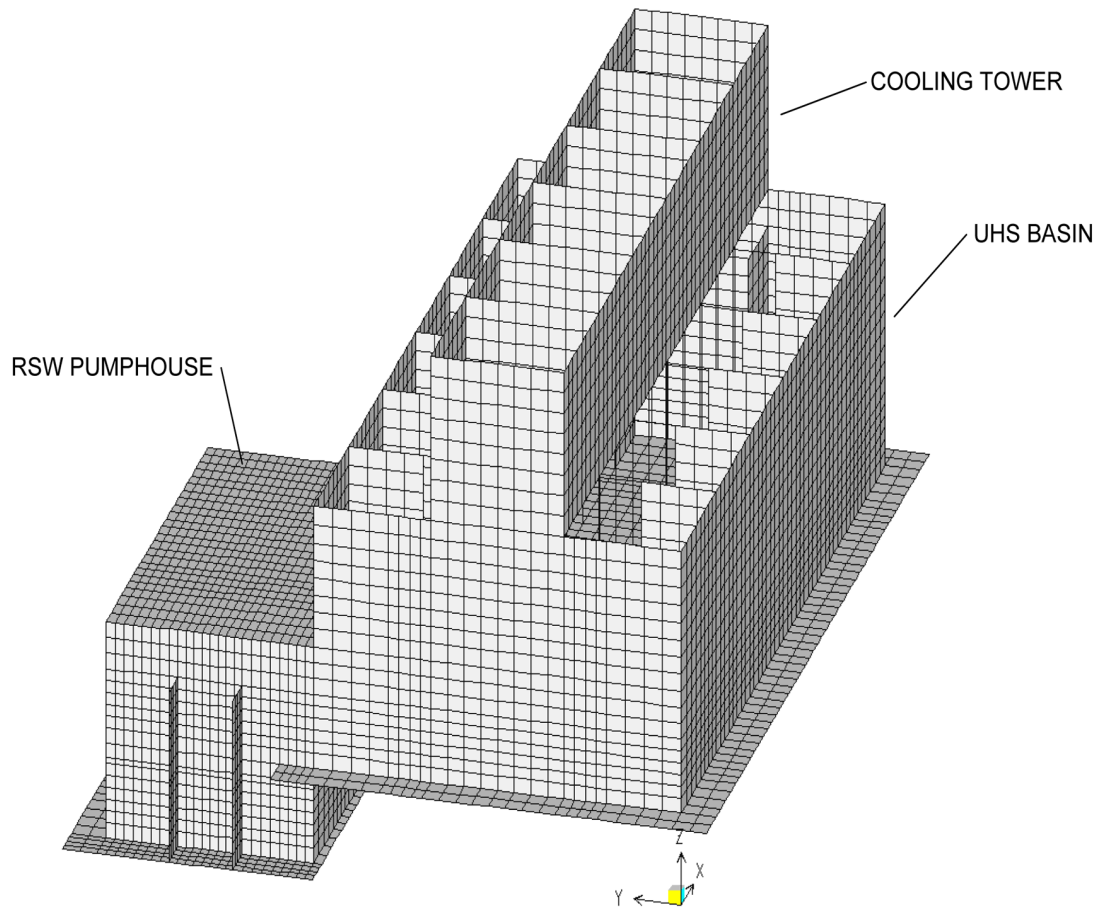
H.6-40 SAP Finite Element Model for UHS and RSW Pump House Design
